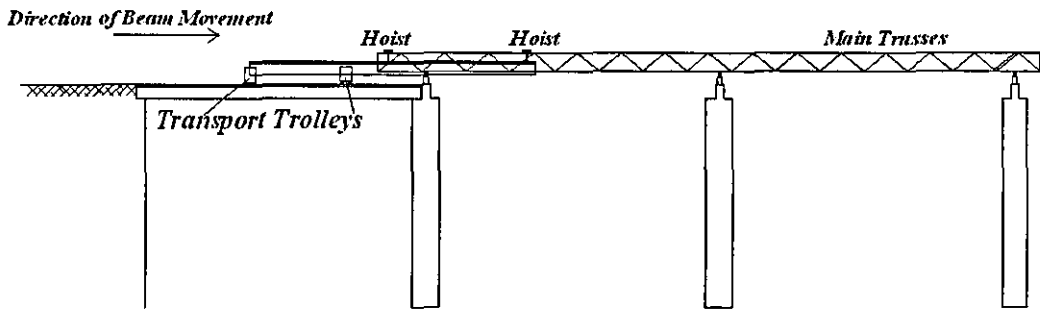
Trusses loading a precast beam (DSI, 1995)
